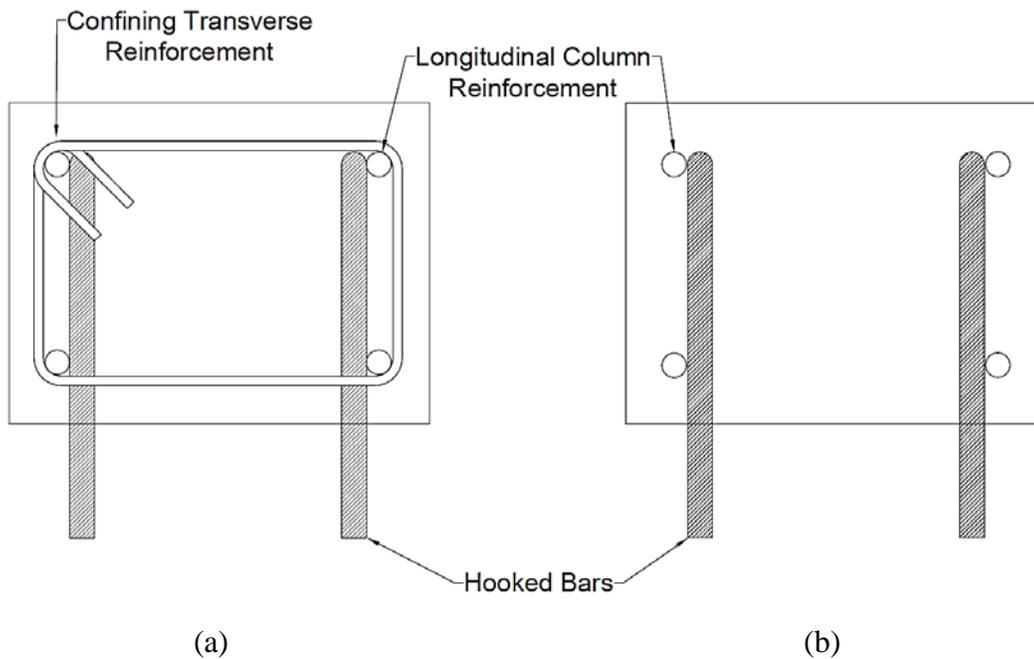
Cross section detail of specimens without crossties (a) with transverse reinforcement and (b) without transverse reinforcement.
